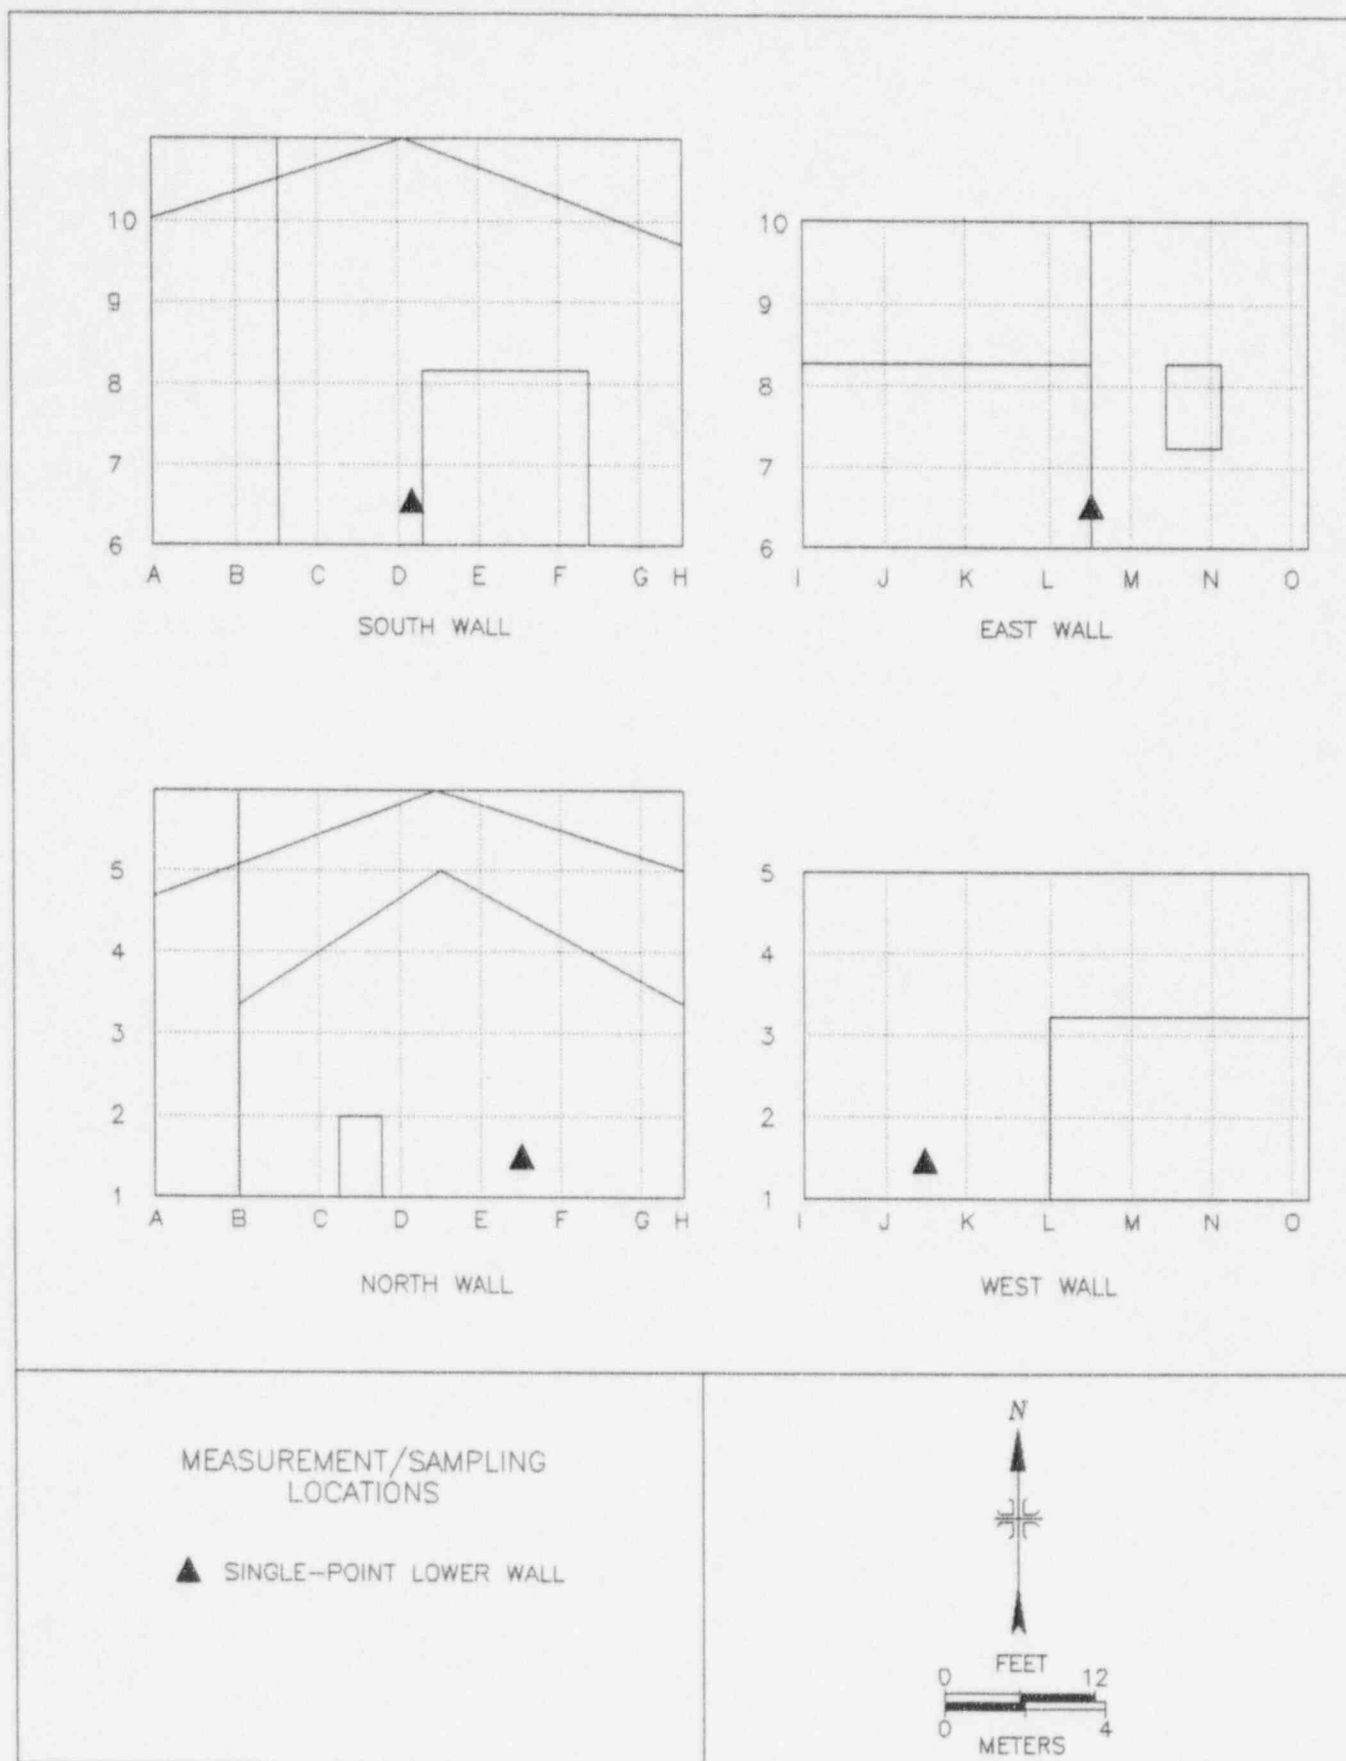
Building 10C, Walls — Measurement and Sampling Locations
